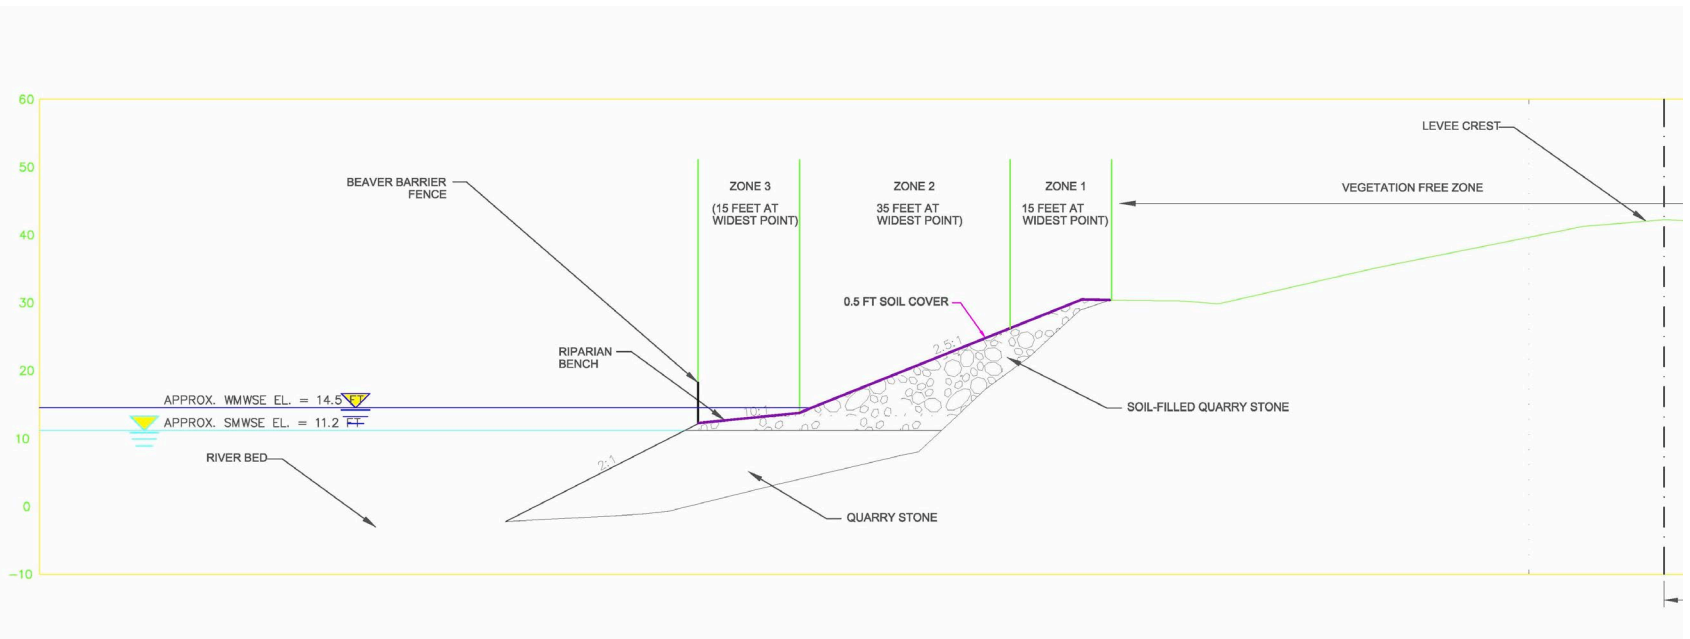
Cross section of the bank repair for the Sacramento River Bank Protection Project work to be completed at river mile 71.3 of the Sacramento River
